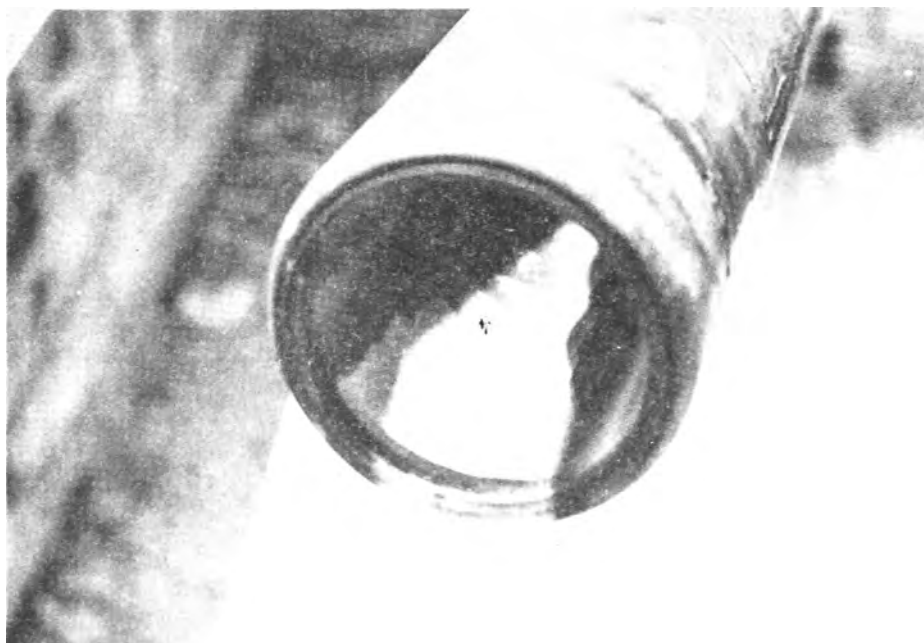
Breach of the lining in the upstream end of the Epoxy Pipe (Test 3).
